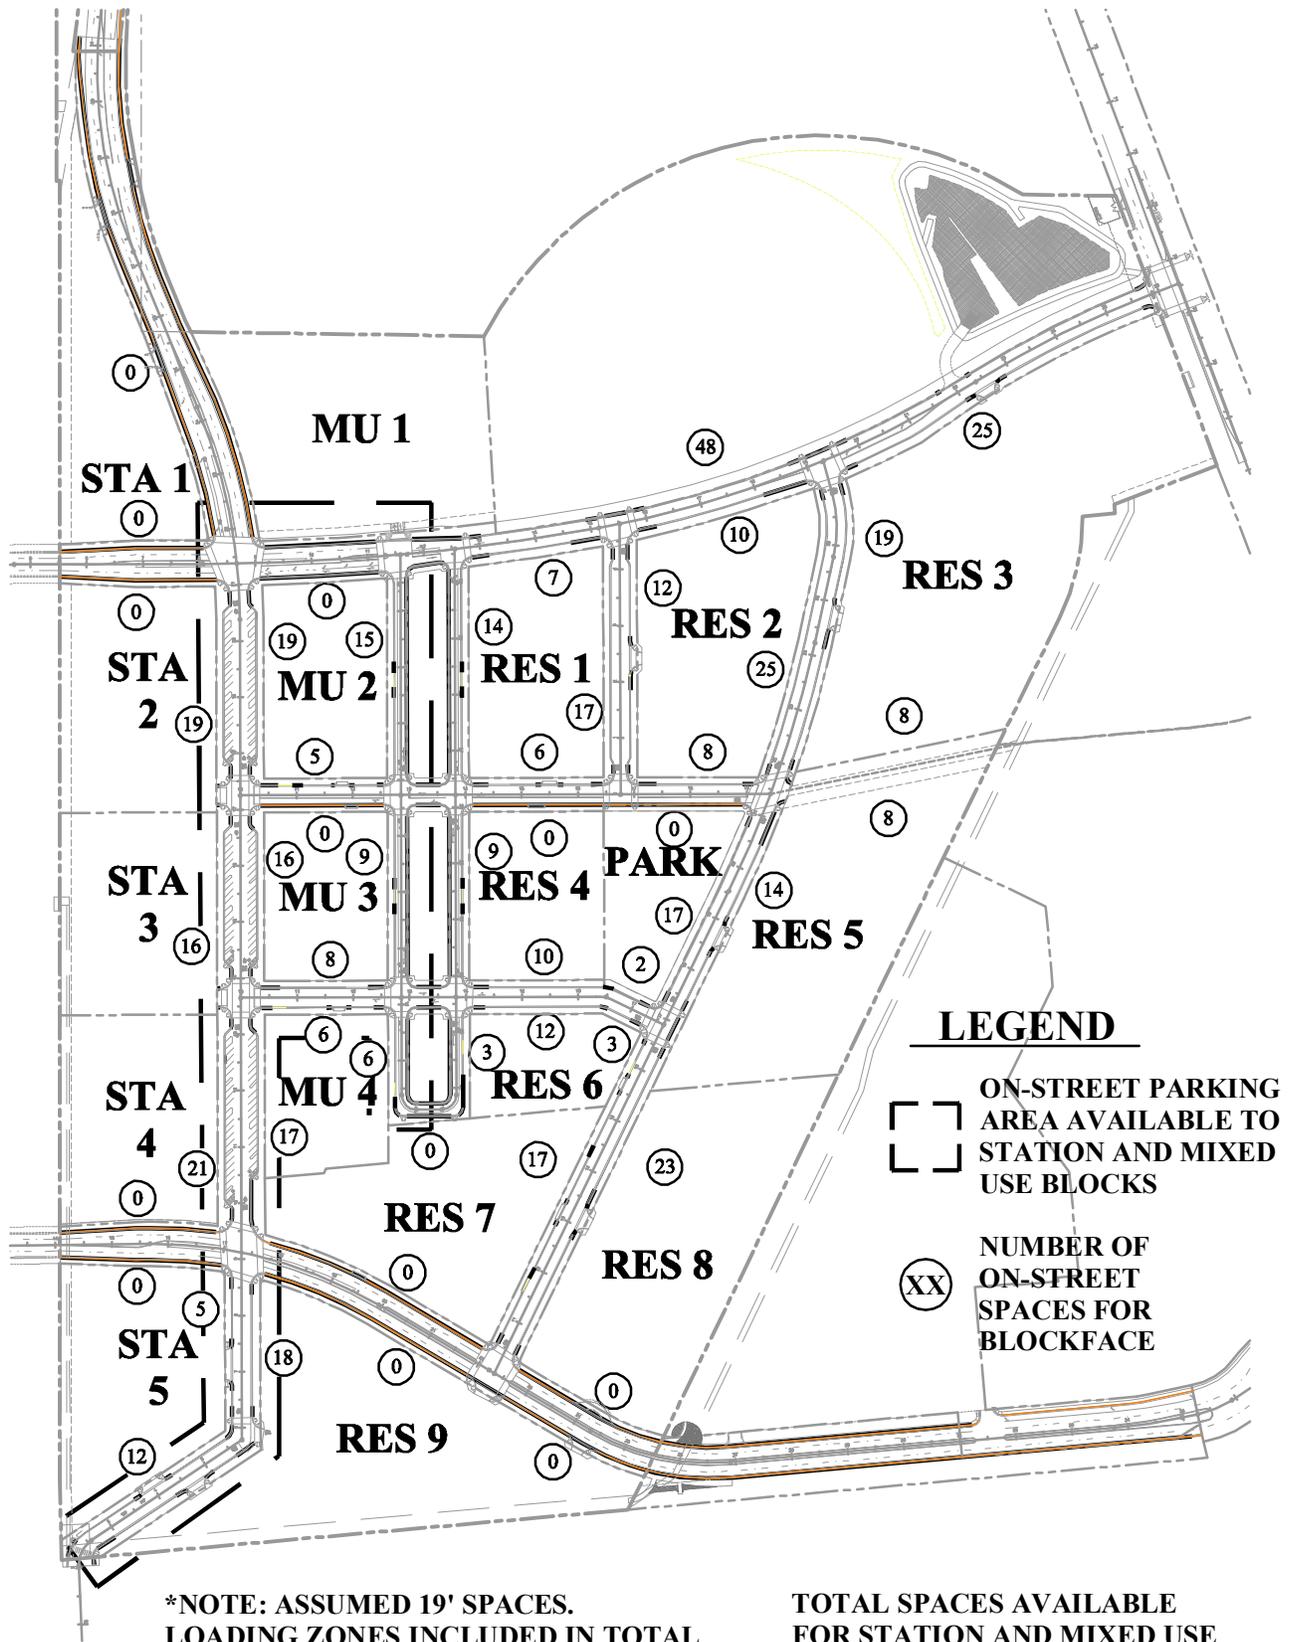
ON-STREET PARKING SPACES BY BLOCK
